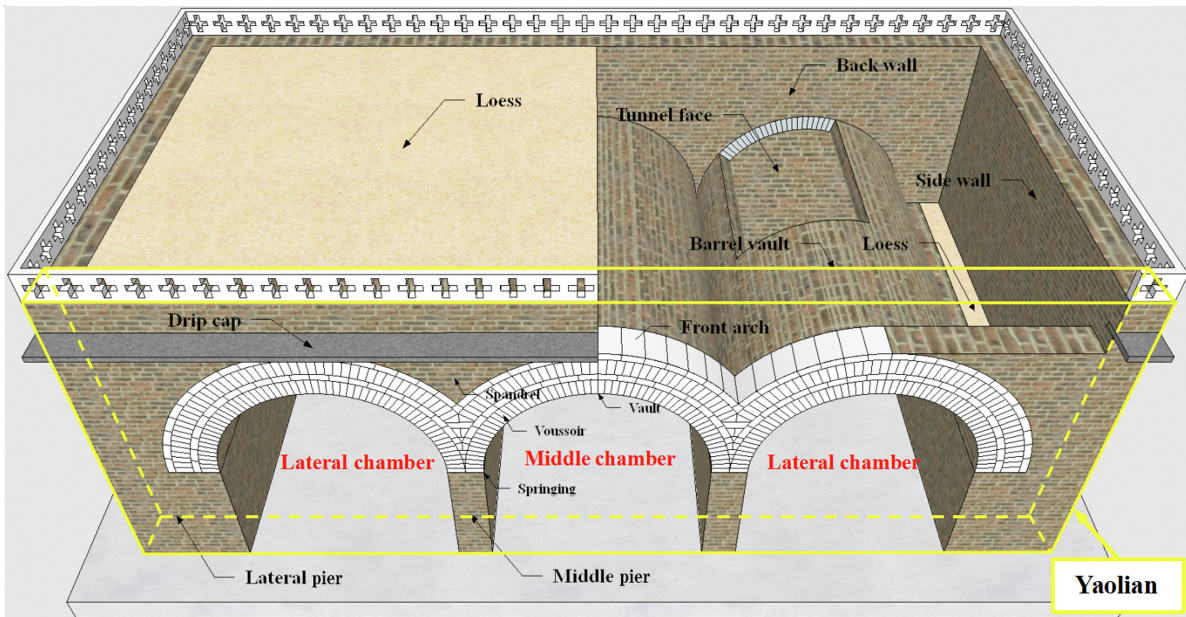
Structural diagram of brick cave dwellings (Xue et al., 2021)
